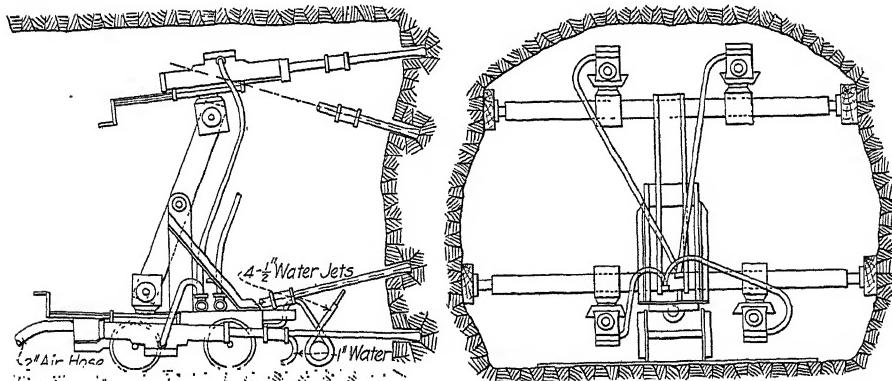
ROCK-DRILL CARRIAGE USED AT CENTRAL MINE.
